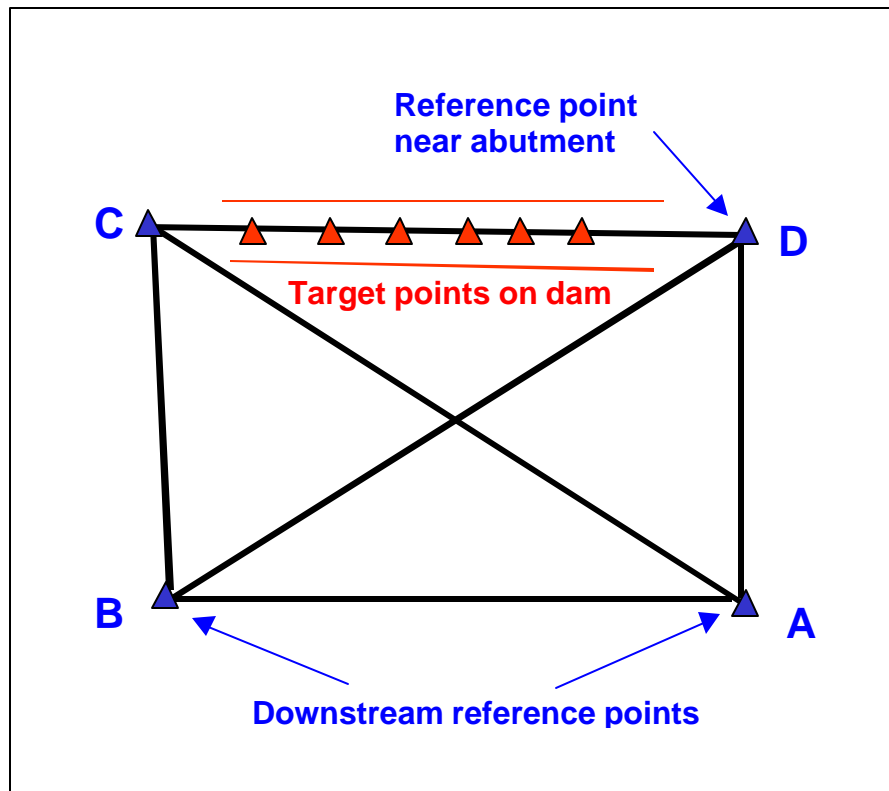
Strong monitoring scheme for a concrete or earth/rockfill dam
